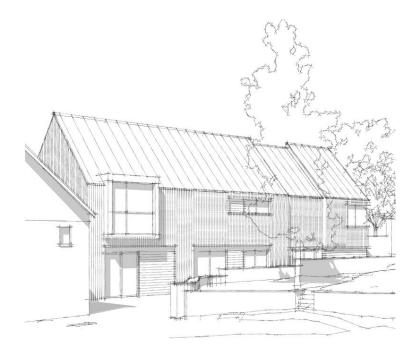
extract - Site Sketch prepared by ACA showing east elevation of extension from Stone Hill House
